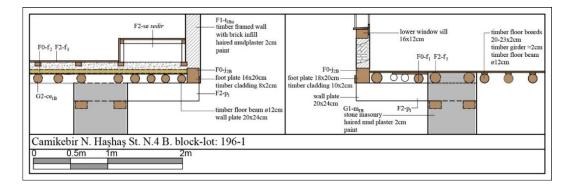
Section drawings of projection supported with a beam; simple projection, Type1 (Camikebir N. b.block-lot: 196-1)
